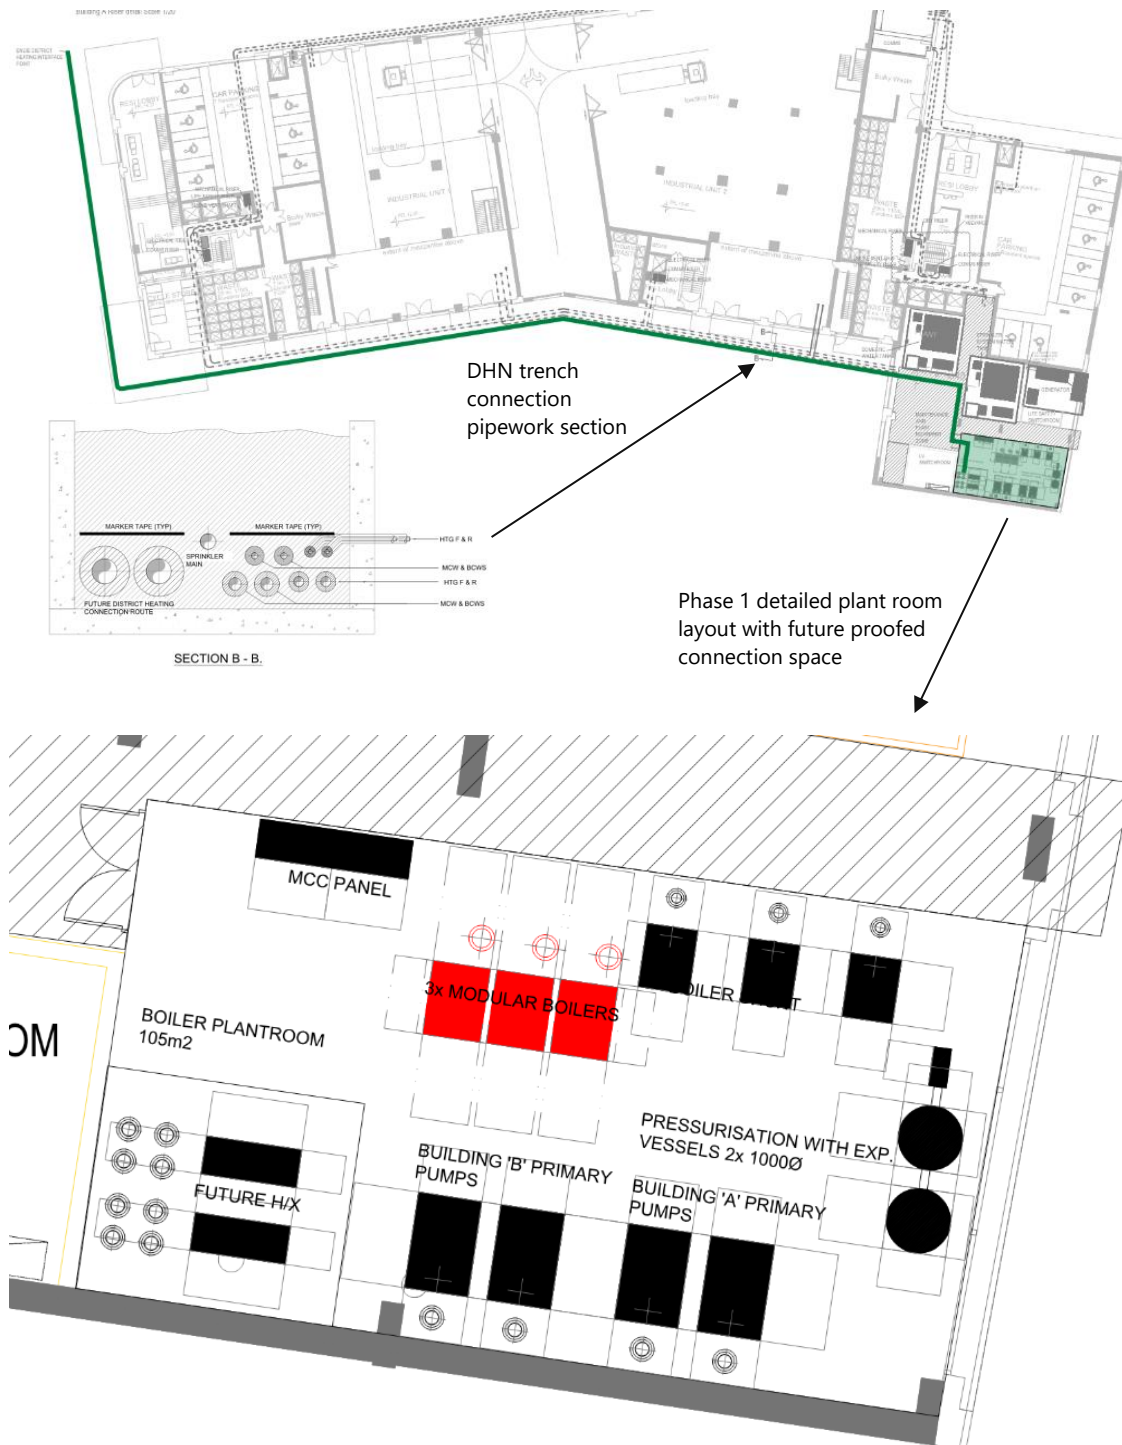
14 Detailed plant room layout and DHN connection routing for Phase 1
